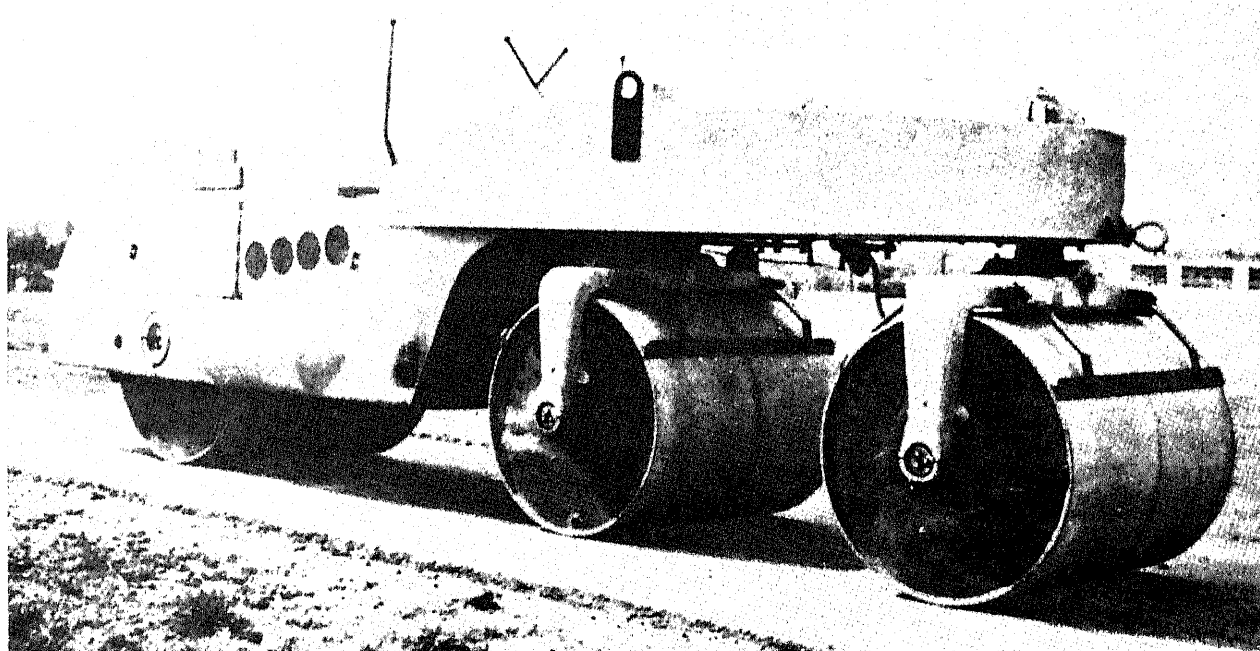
Three-axle tandem (9- to 14-ton) roller.
